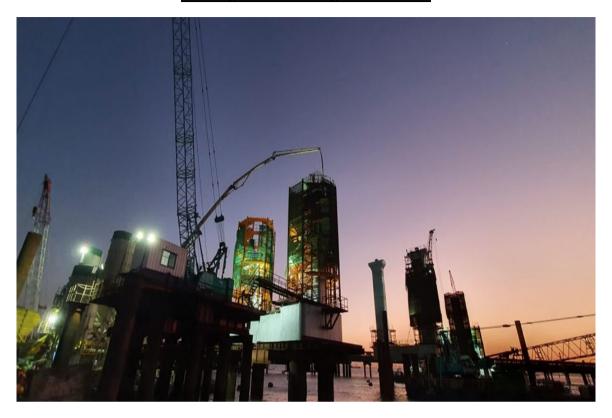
MP 84 N Pier Concrete - Marine Area
